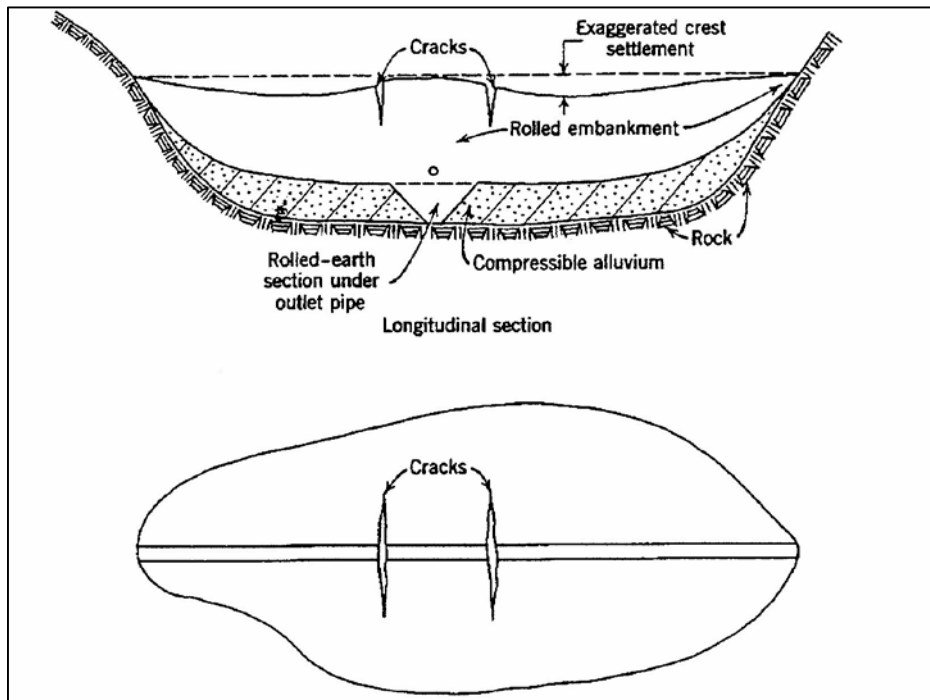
Cracking due to differential settlement between natural foundation soil and rolled-earth support under outlet pipe (or other discontinuity in the foundation).
